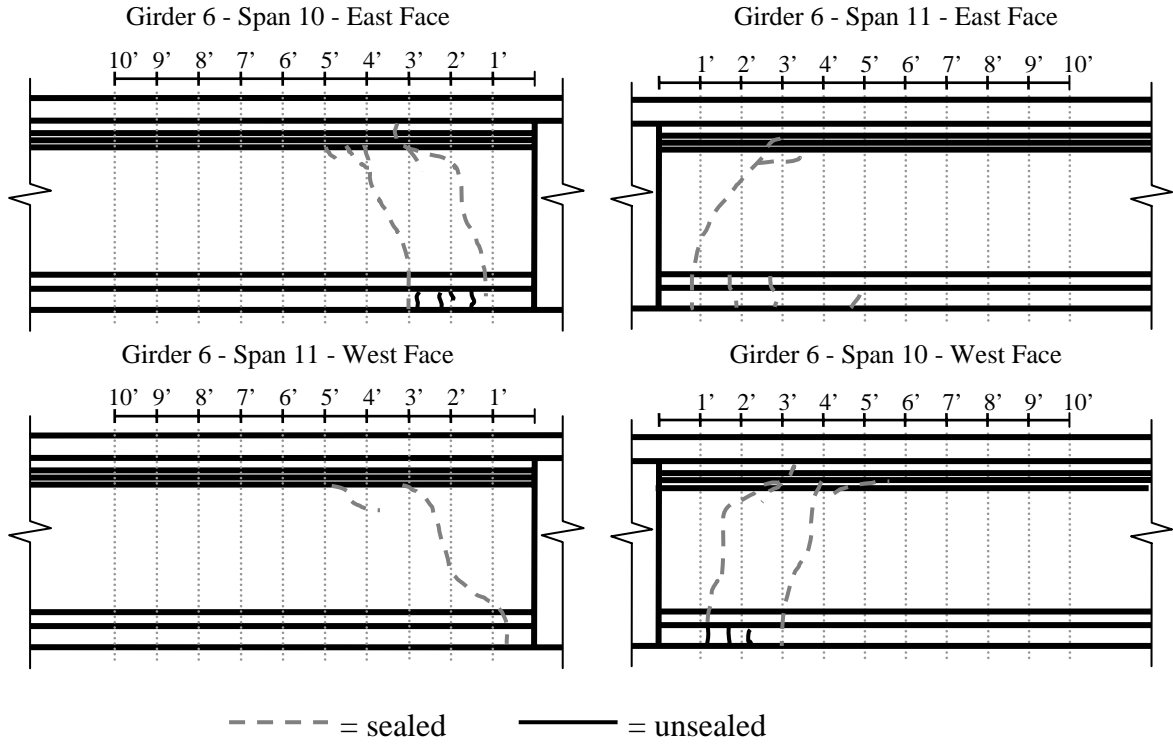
Girder Line 6 Cracking (Fason and Barnes 2004)
